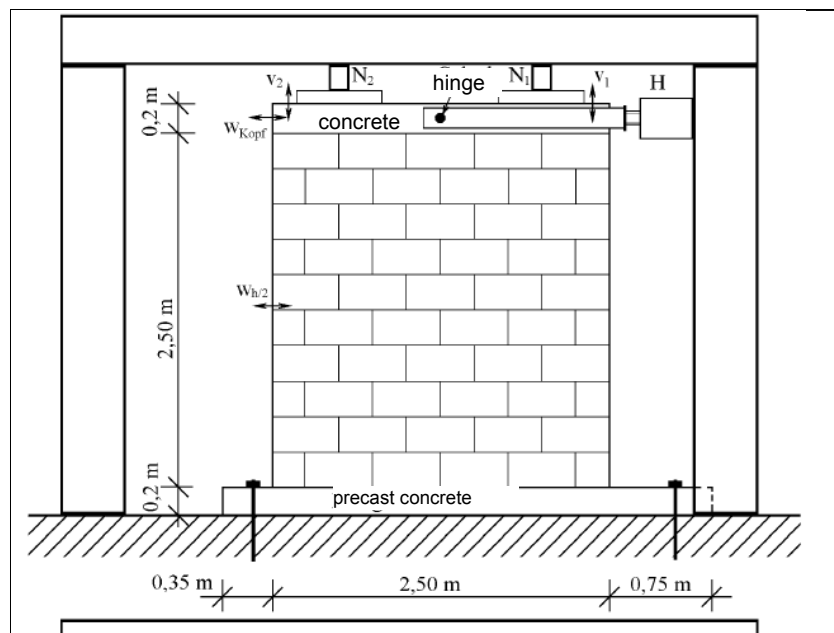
Test set-up for masonry walls under in plane lateral loads (Schermer and Zilch 2004)
